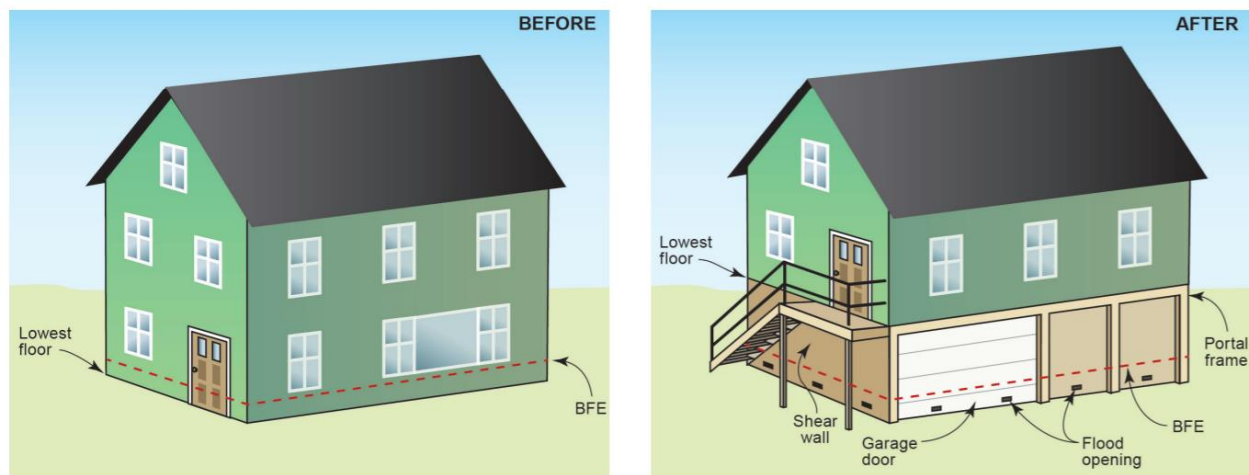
Abandoning the lowest floor and wet-floodproofing (FEMA, 2015)
